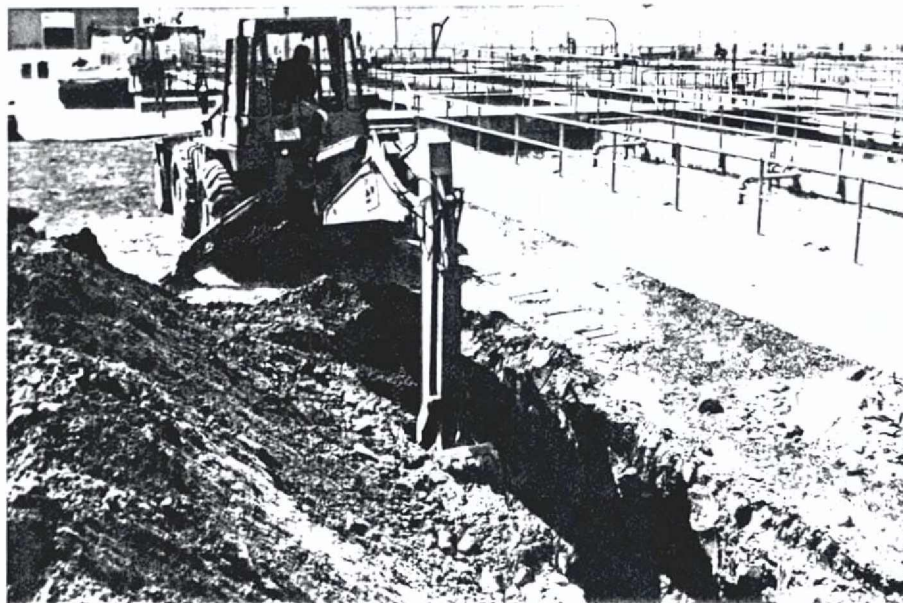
Backhoe trenching   in progress of Backhoe Trench 2 looking southwest.
